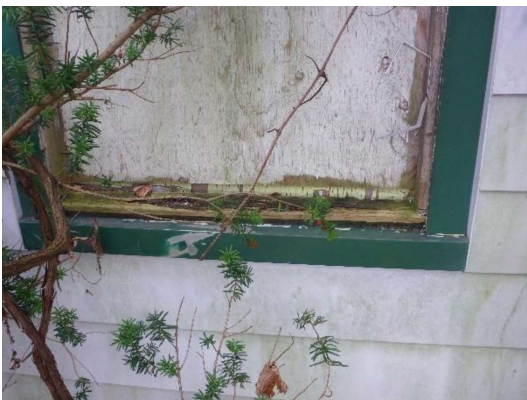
Metal trim on window, which also appears on doors and roof, west façade, looking east
